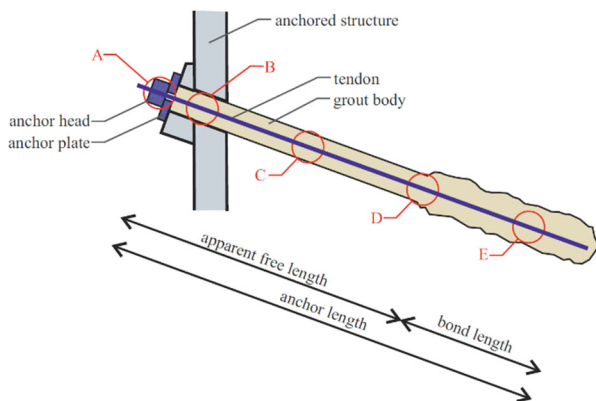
Schematic structure of a pre-stressed grouted anchor.
